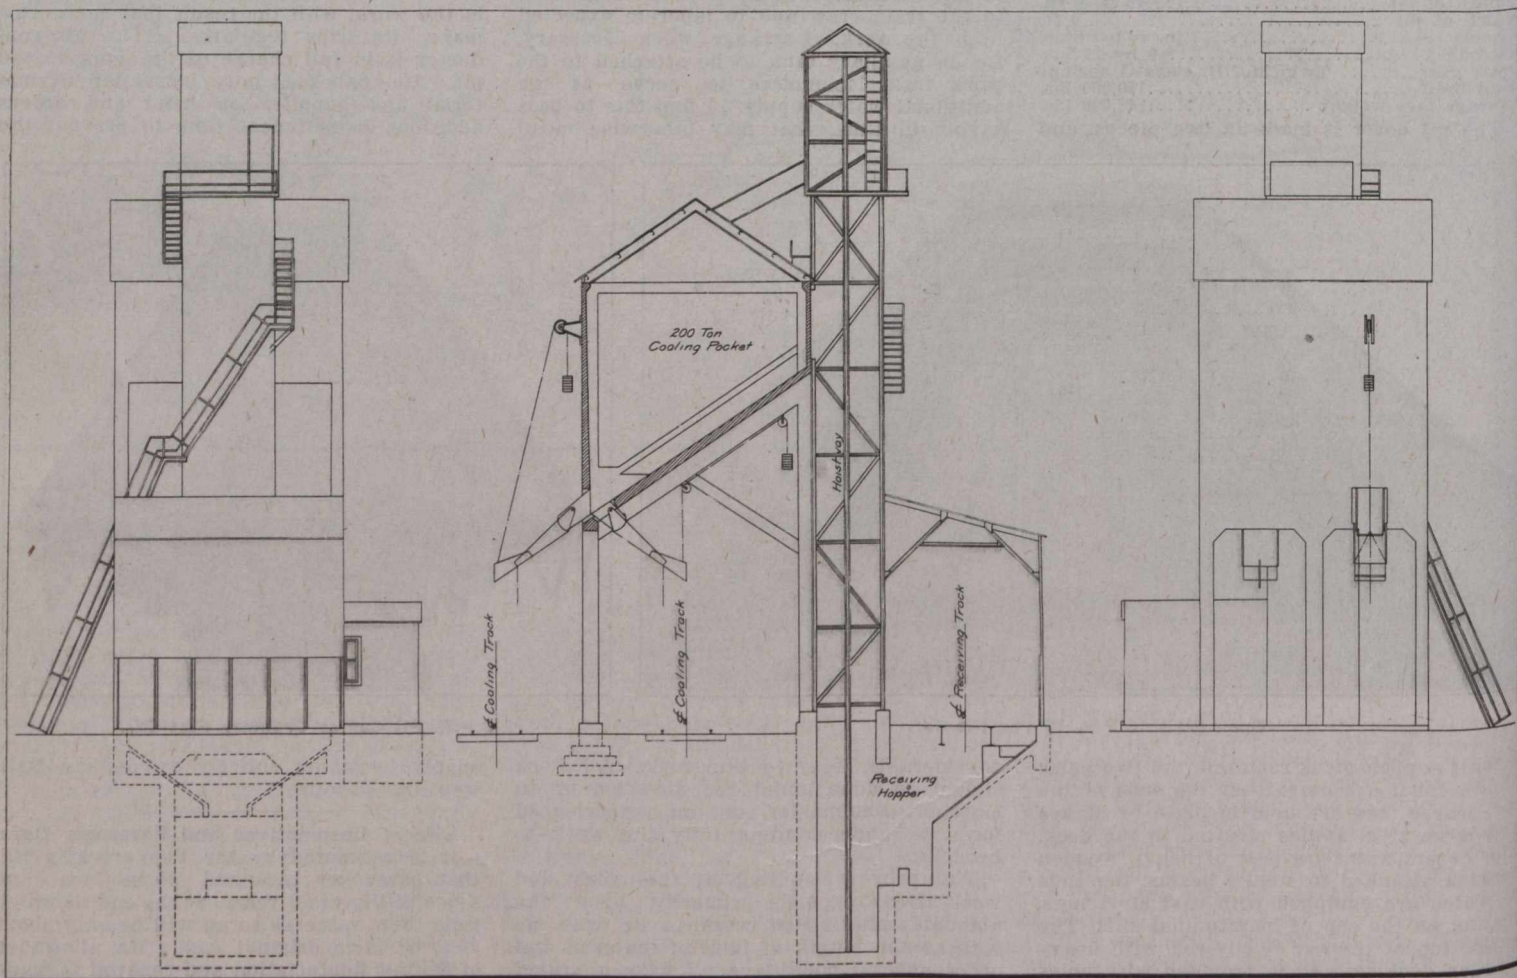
Typical Coaling Plant on the National Transcontinental Ry., Six of Which Are Being Built.
